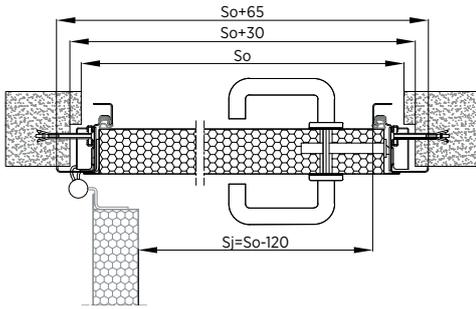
Installation of the single-leaf door to a masonry wall - corner frame with a thermal break - horizontal cross-section
